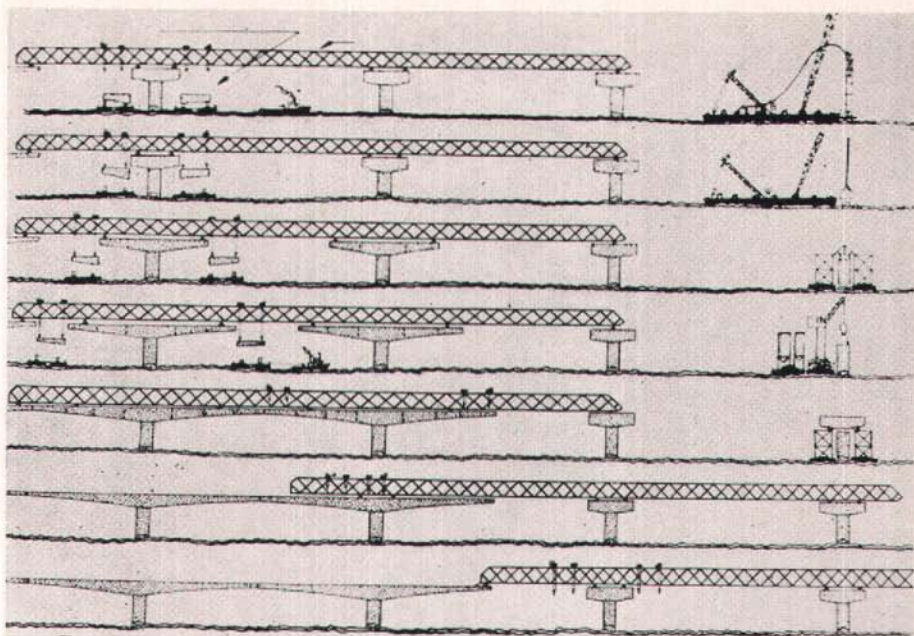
Schematic erection scheme for Oosterschelde Bridge
